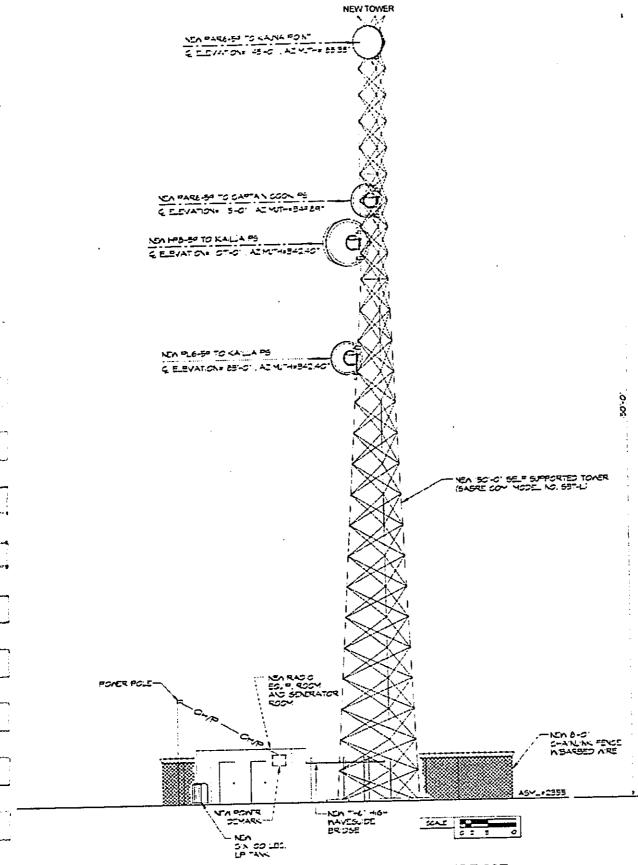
E Ohia Mill / Elevation Plan (looking north)
